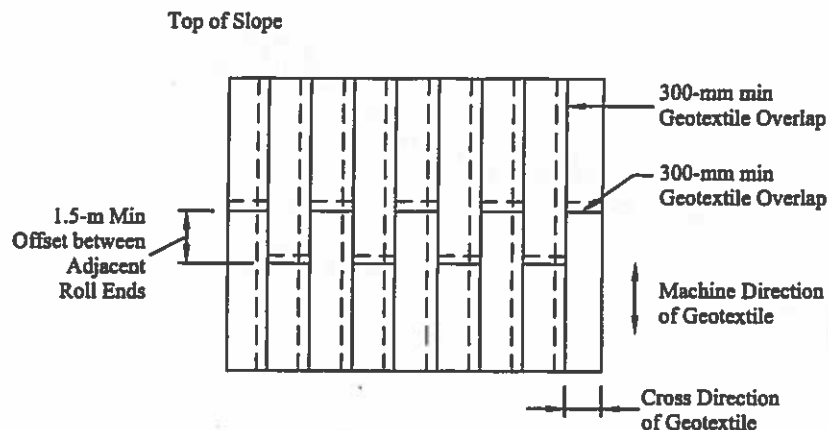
Method of Placing Geotextile for Protection of Cut and Fill Slopes
